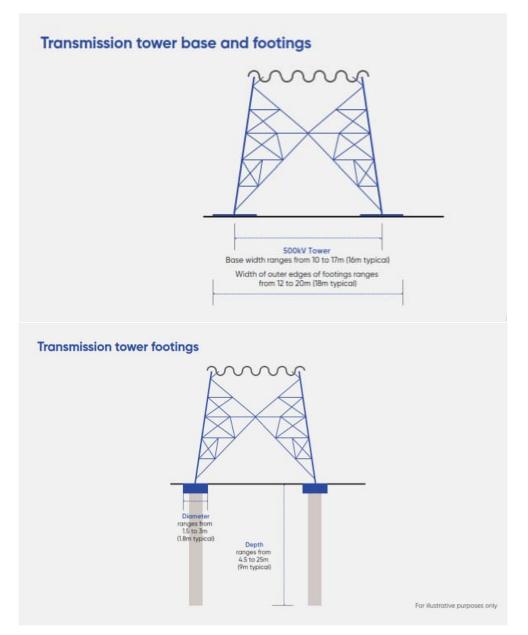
Proposed transmission line tower base and footings dimensions (Source: AusNet, 2025)
